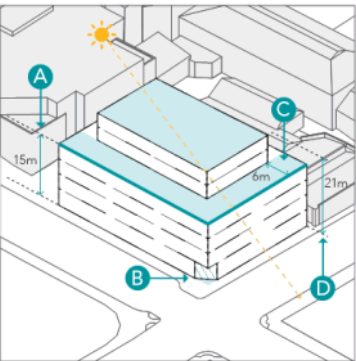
Diagram showing street wall height, setback and corner treatment. Refer to section 2.12 for overshadowing controls.
